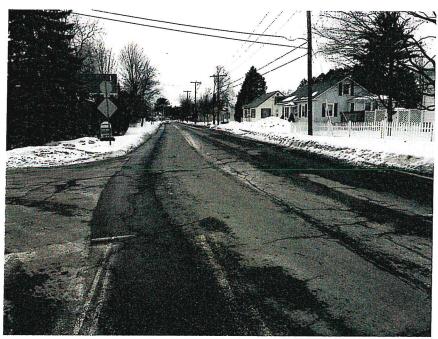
(Station 00 ±00) Intersection with South Street Project Start
